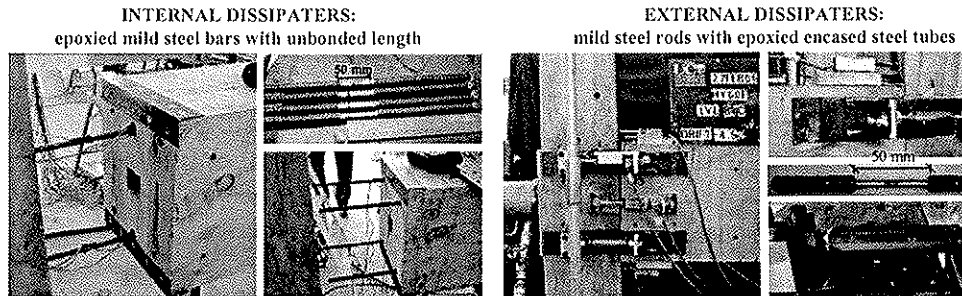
Construction details of beam-column subassemblies with internal and external dissipaters.
